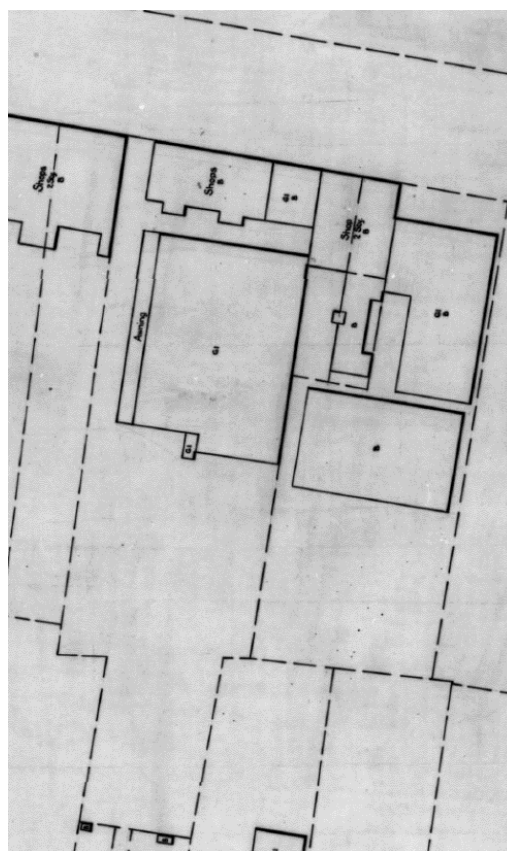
Detail from DS 2711, 1954 depicting the footprint of two interconnected buildings along the George Street alignment and a large building to the south with an awning stretching along the western extent. (Source: Sydney Water Archives, detail survey)
